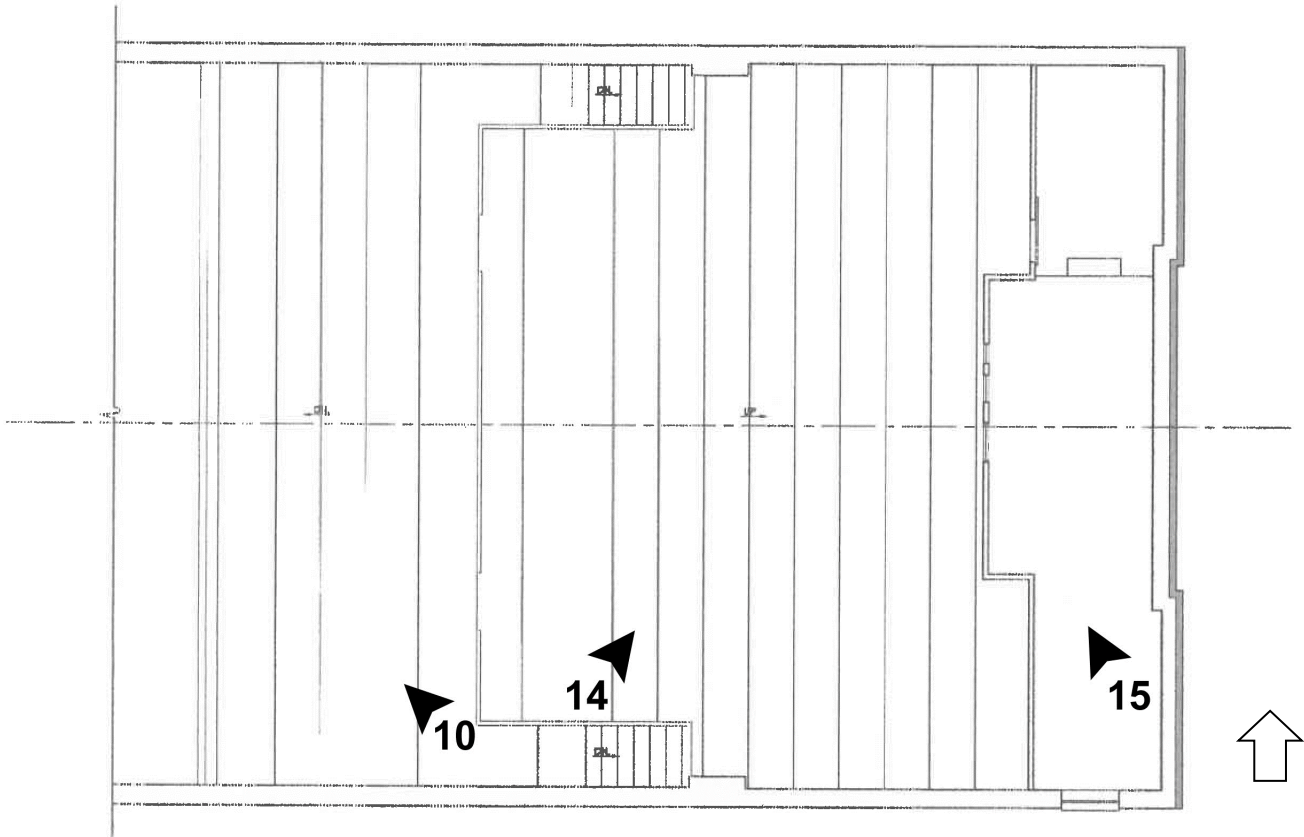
First floor sketch plan with photo keys. Base plan modified from plans on file with Iola Theatre Association. Not to scale.
